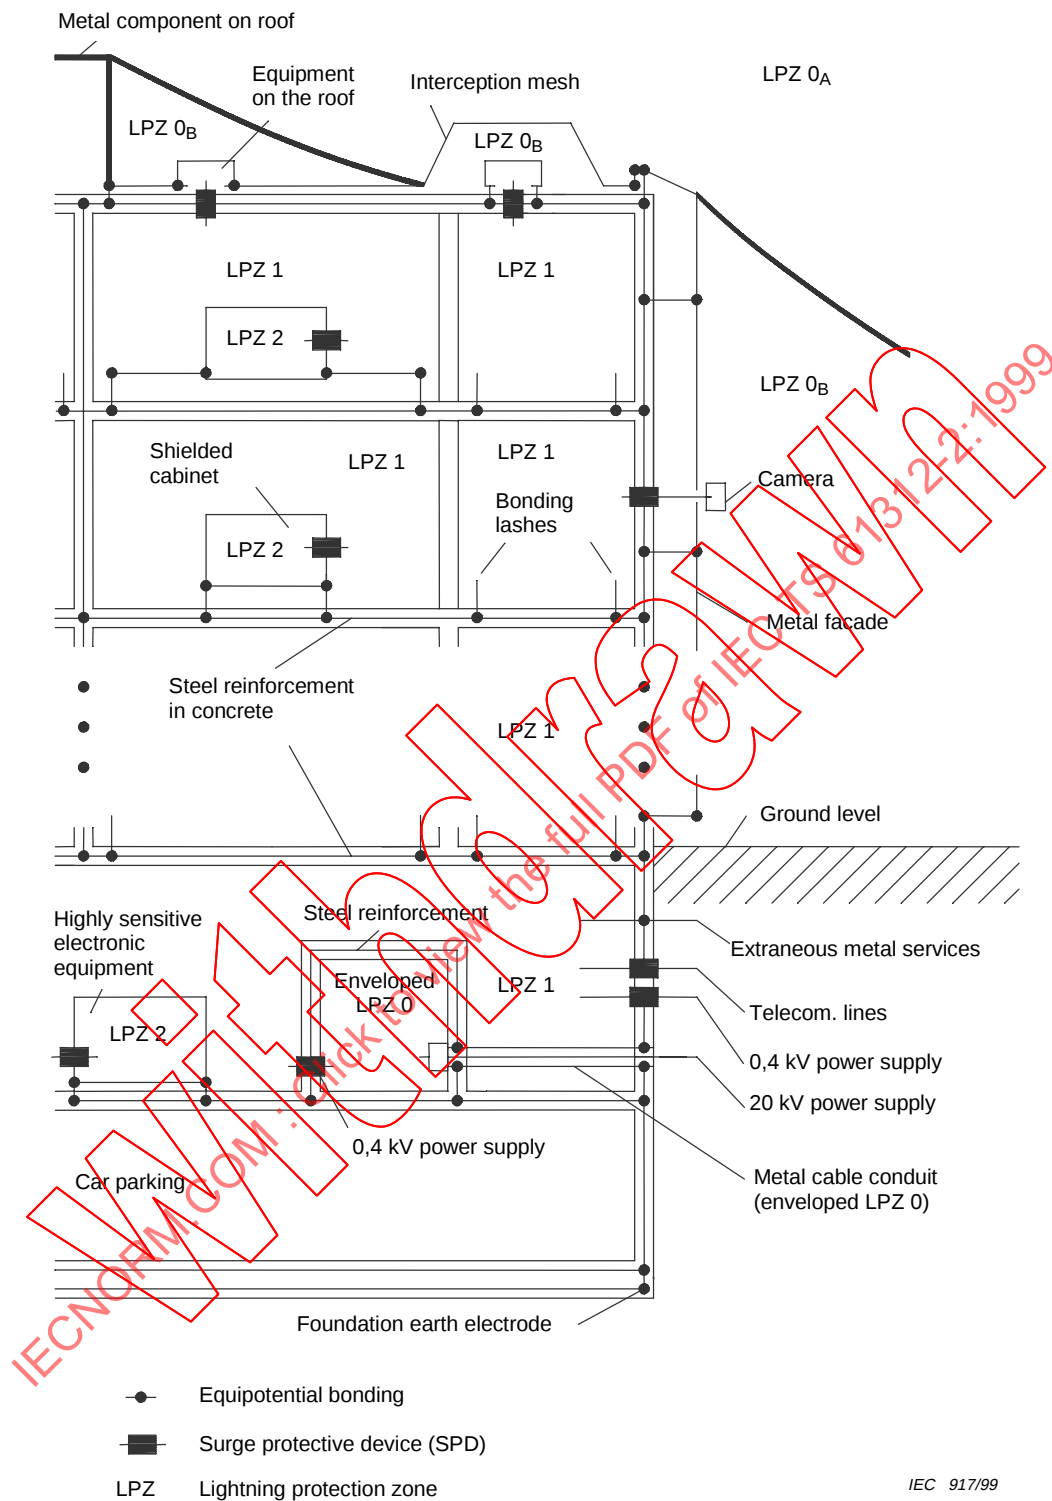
Example of design of lightning protection zones, shielding, bonding and earthing for an office building
